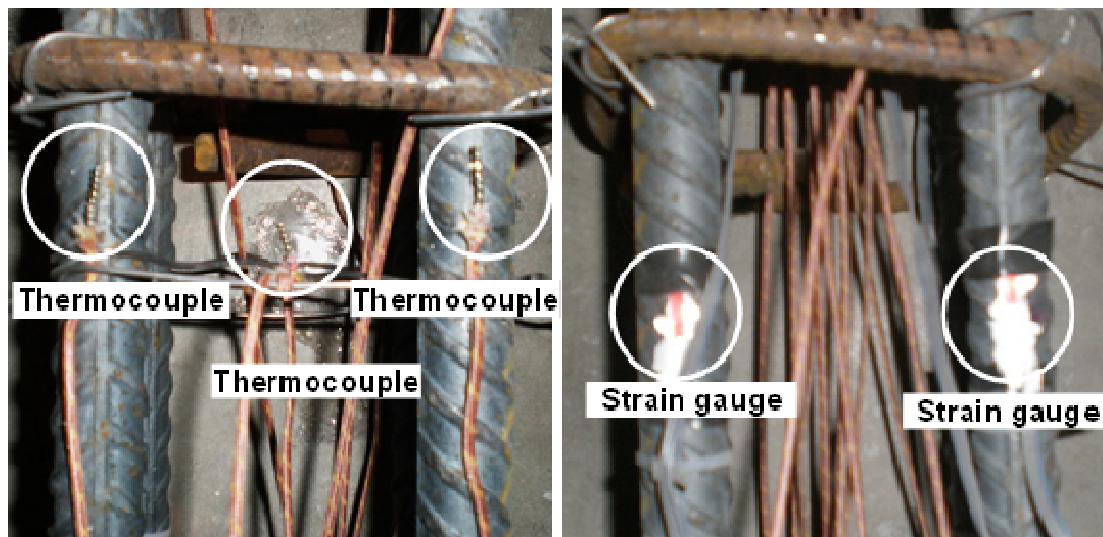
View of thermocouples in cross-section and strain gauges attached to steel rebars
